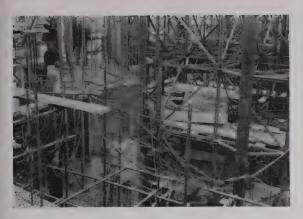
Internal "Spider" and shuttering to Octagon Walls.
